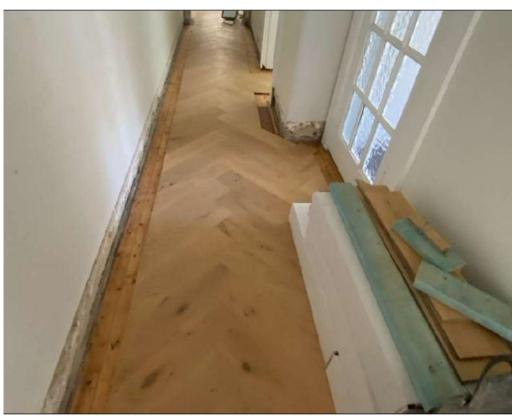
The hallway has had parquetry laid over the original floor boards (*Source: Weir Philips Heritage and Planning*)
